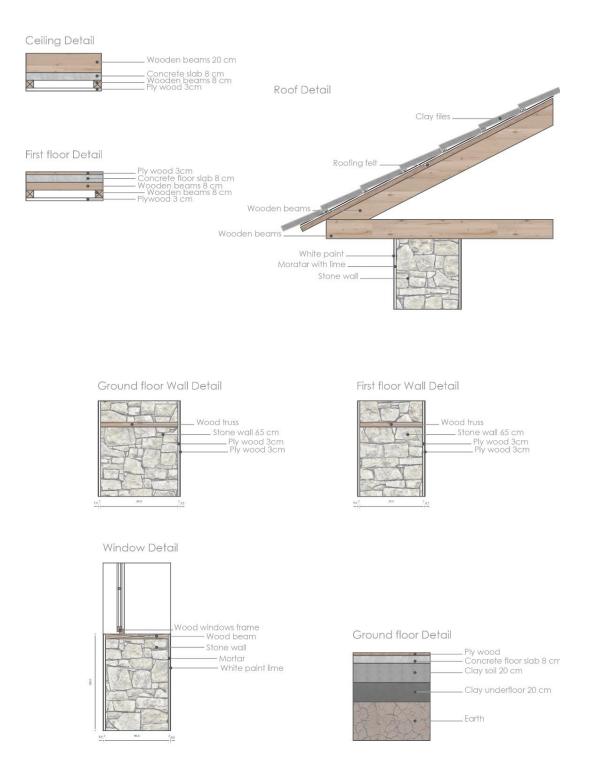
Beqiri, A. (2024), Adem Zeko Construction Details
